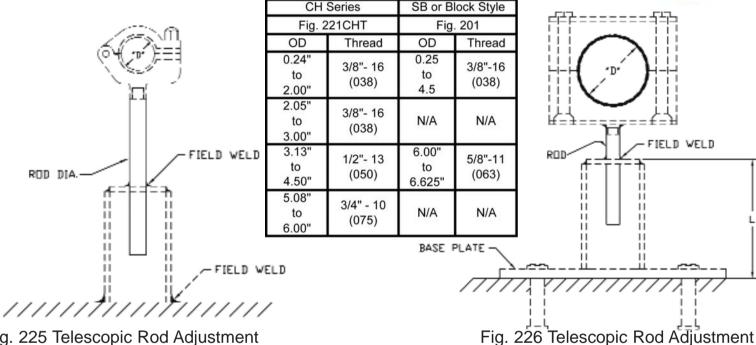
Telescopic Rod Adjustment to the tubes elevation
